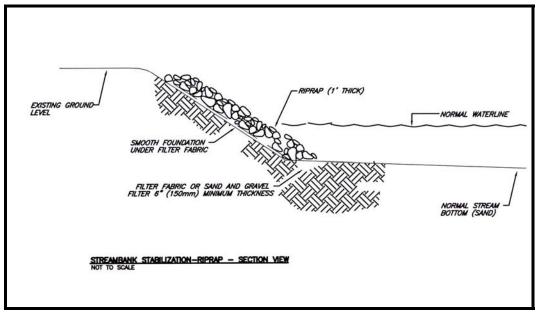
Conceptual cross section view of streambank stabilization using stone.
